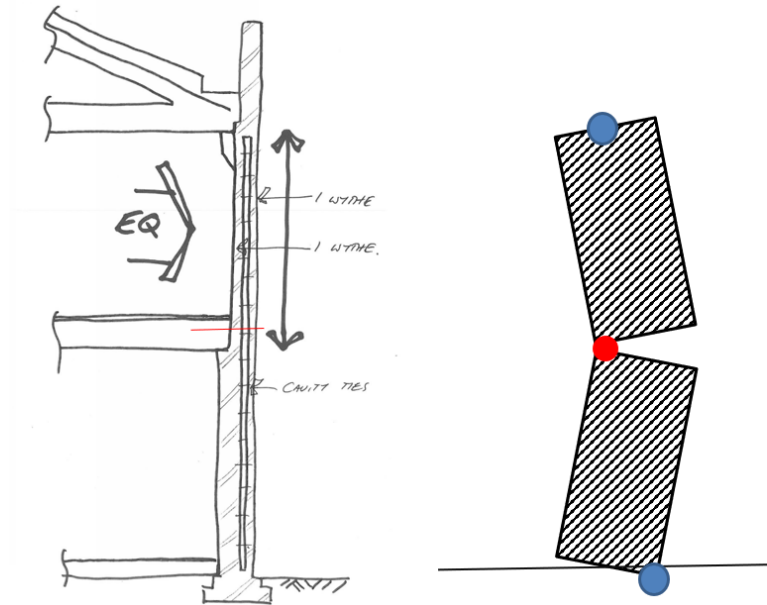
B.31: Boundary conditions for upper cavity wall with parapet above
